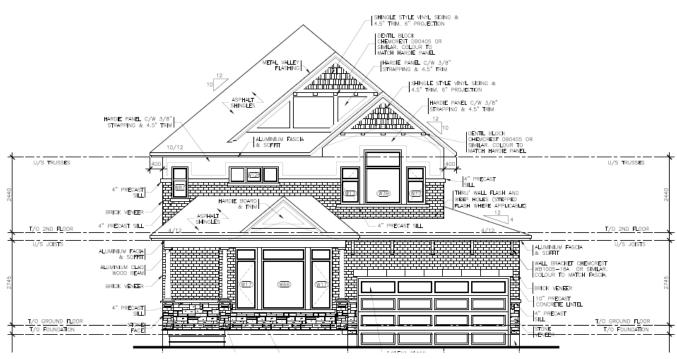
Typical front elevation drawing of a proposed dwelling unit model
